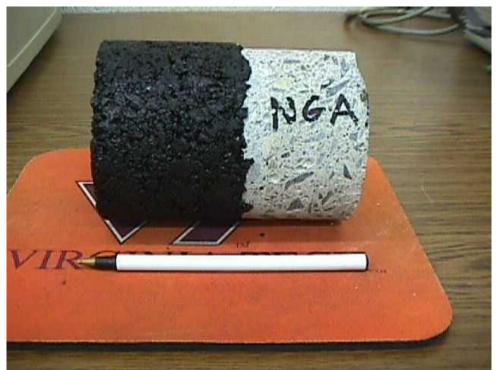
Typical Control Bridge Deck Specimen before Failure.
